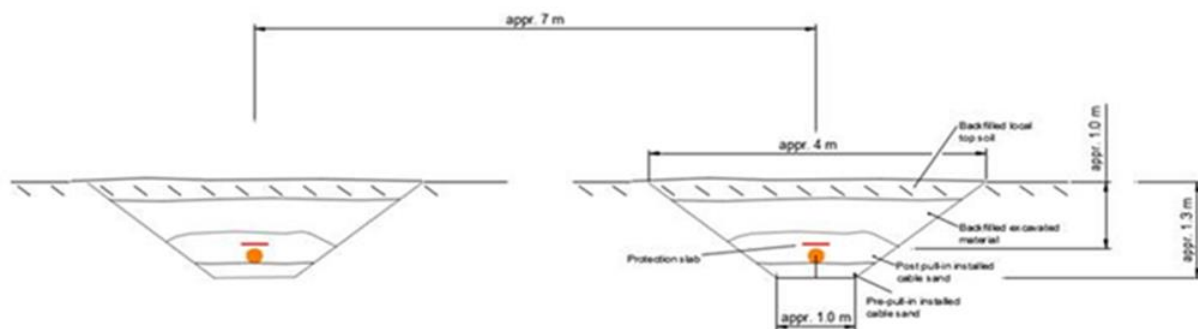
Onshore Cable Trench Cross-section a Two-Trench Design
